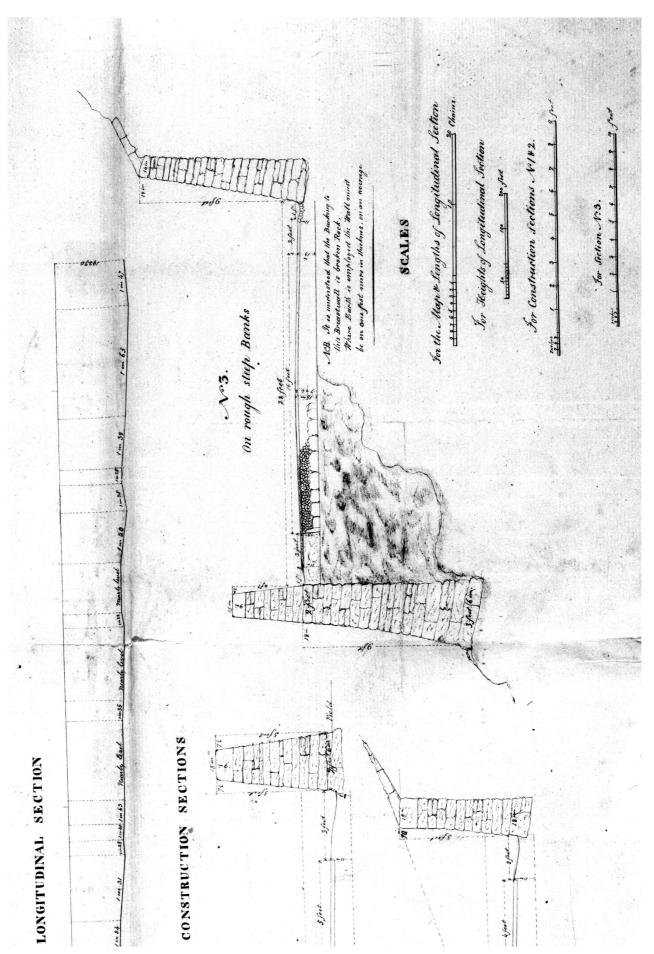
Section showing how retaining walls were to be used on steep banks in Lot 3 (Public Record Office)
